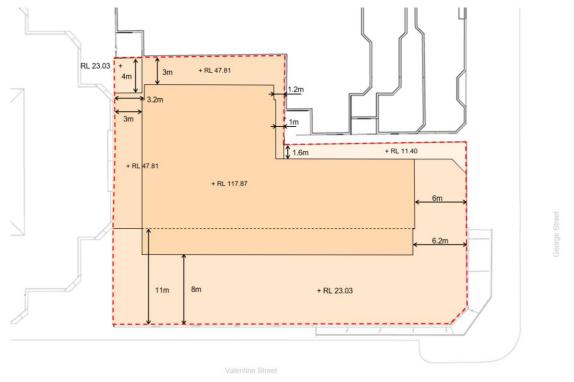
XX 757-763 George Street, Haymarket – Indicative ground floor layout
